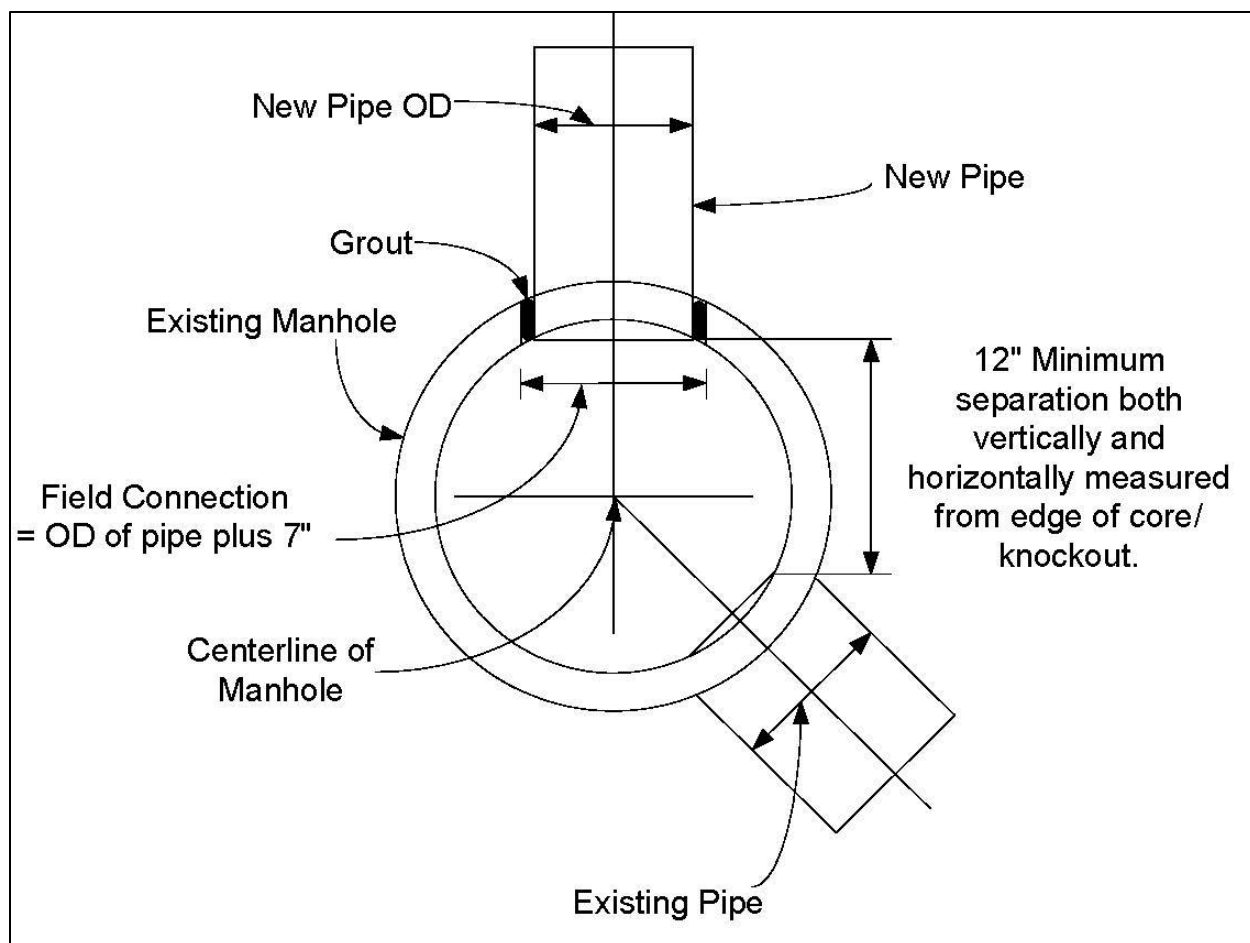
New Pipe Connection to an Existing Manhole⁴⁴
